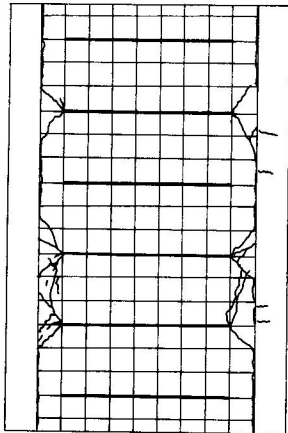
FINAL CRACK PATTERN OF PANEL A
